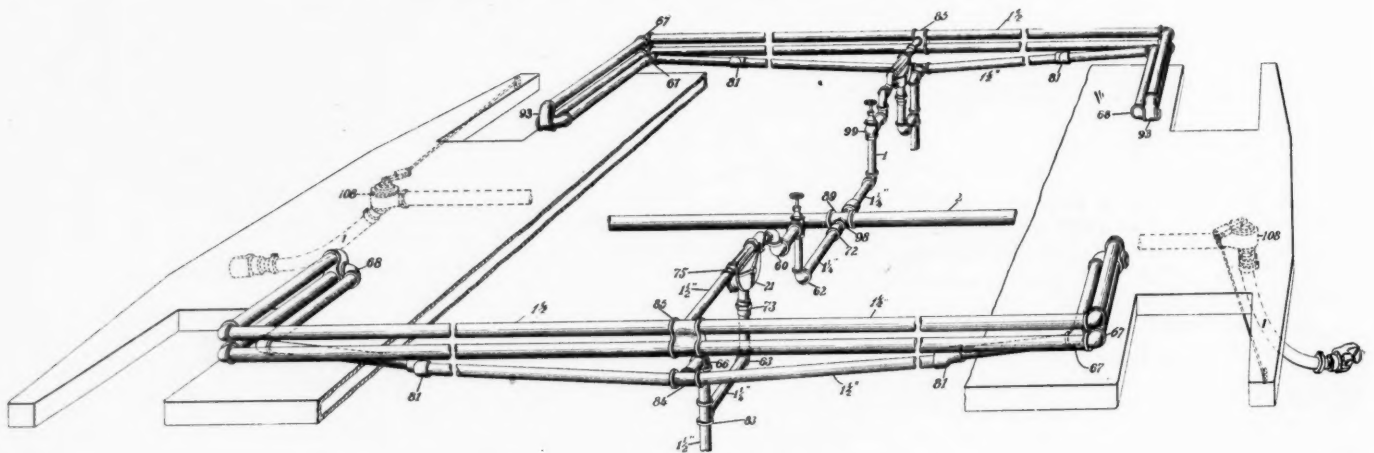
Plan of Piping for Ward Ideal Heating System.
